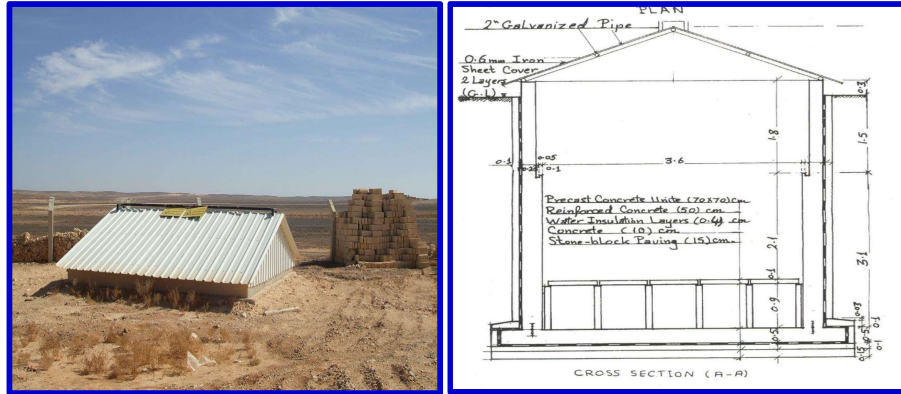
Left: The rectangular underground reinforced concrete pit, Right: The layout sketch of the near Surface rectangular Reinforced concrete underground pit
